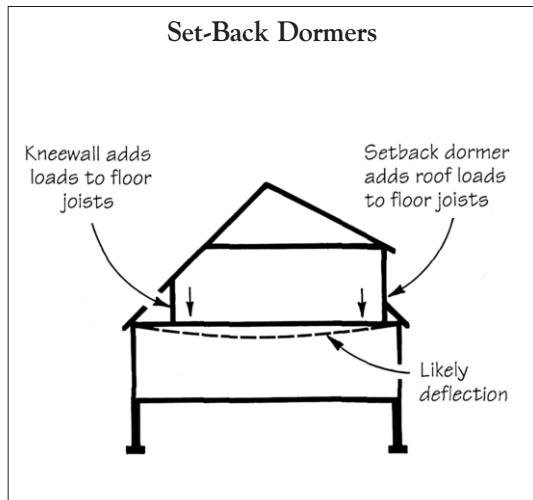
If you set back the front wall of a shed dormer for aesthetic reasons, make sure the floor joists can handle the additional roof loads. A kneewall on the non-dormered side of the roof shortens the rafter span but also adds roof loads to the floor.
